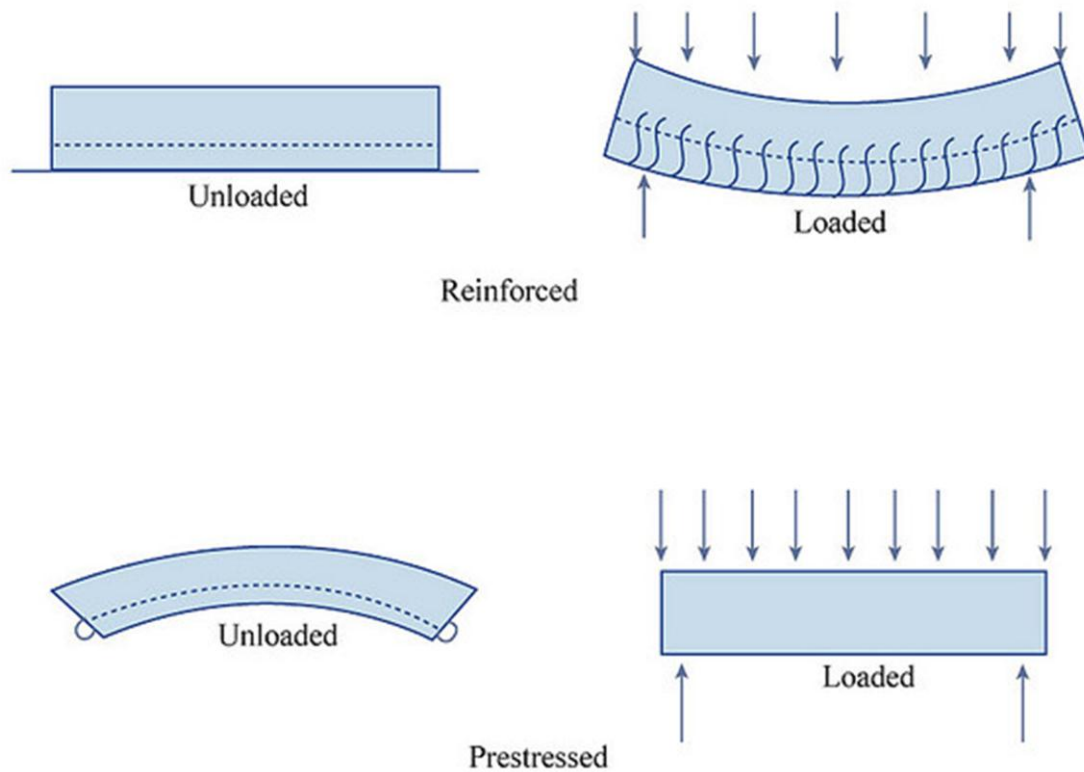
Schematic picture of reinforced and prestressed concrete (OpenCourseWare, 2008)
